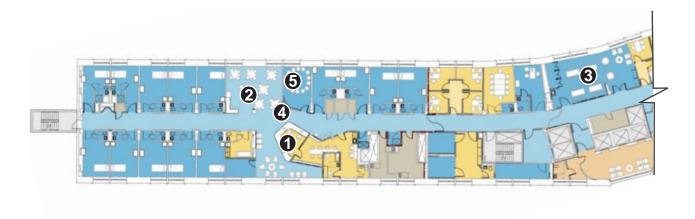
MedStar Harbor Hospital, Floor Plan
